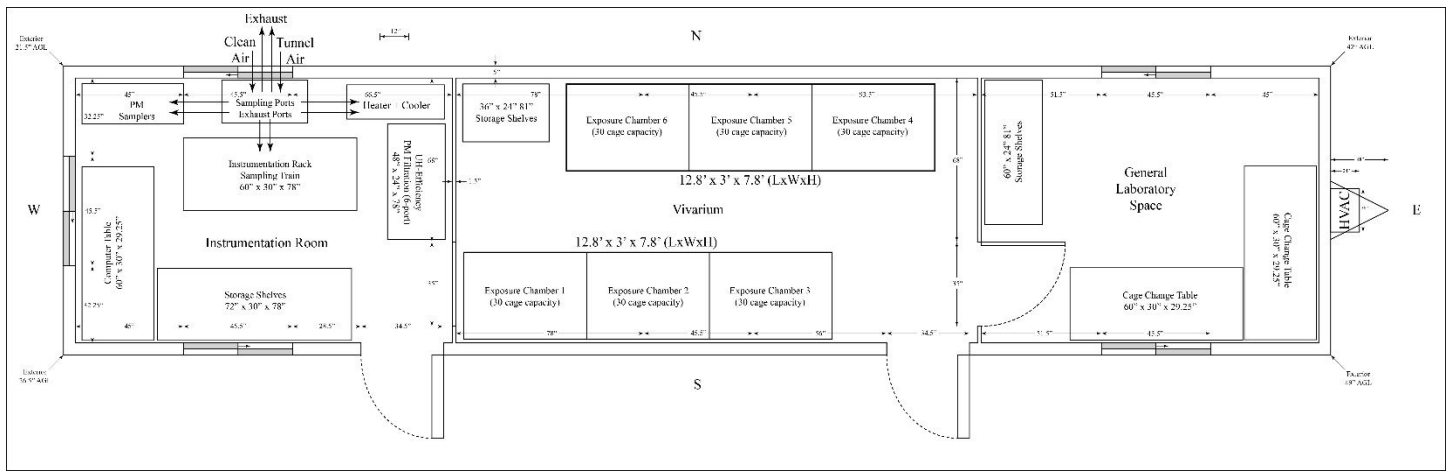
Onsite CTEF office trailer floorplan showing the general layout of the various rooms, including the instrumentation room, vivarium with exposure chambers, and general laboratory and storage space.
